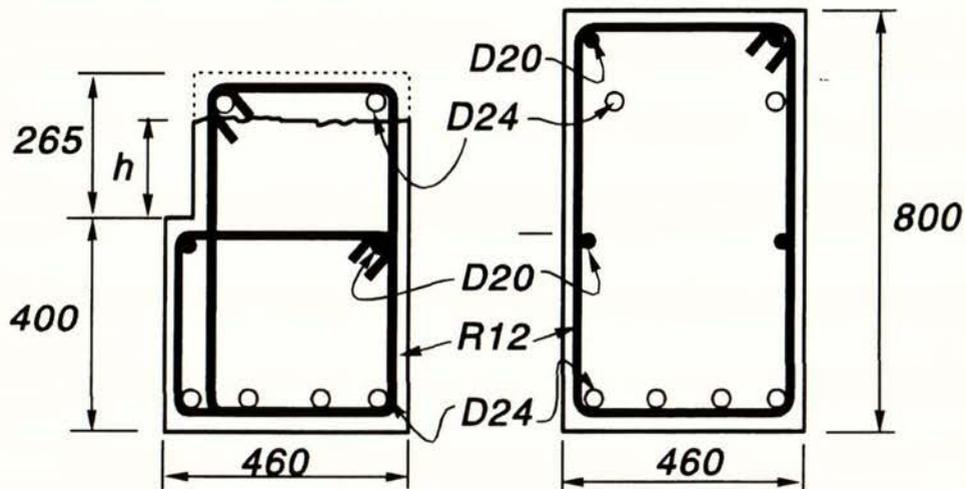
Dimensions of Precast Concrete Beam Used as Support 3.
